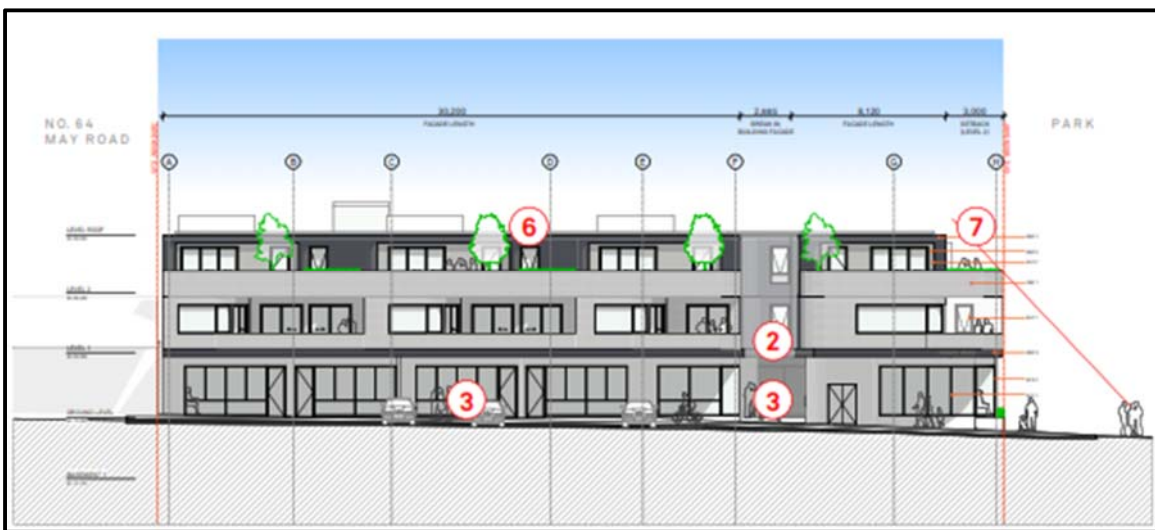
South Elevation – facing carpark and Warringah Road (Source: Benson McCormack, Project No. 1853A)
